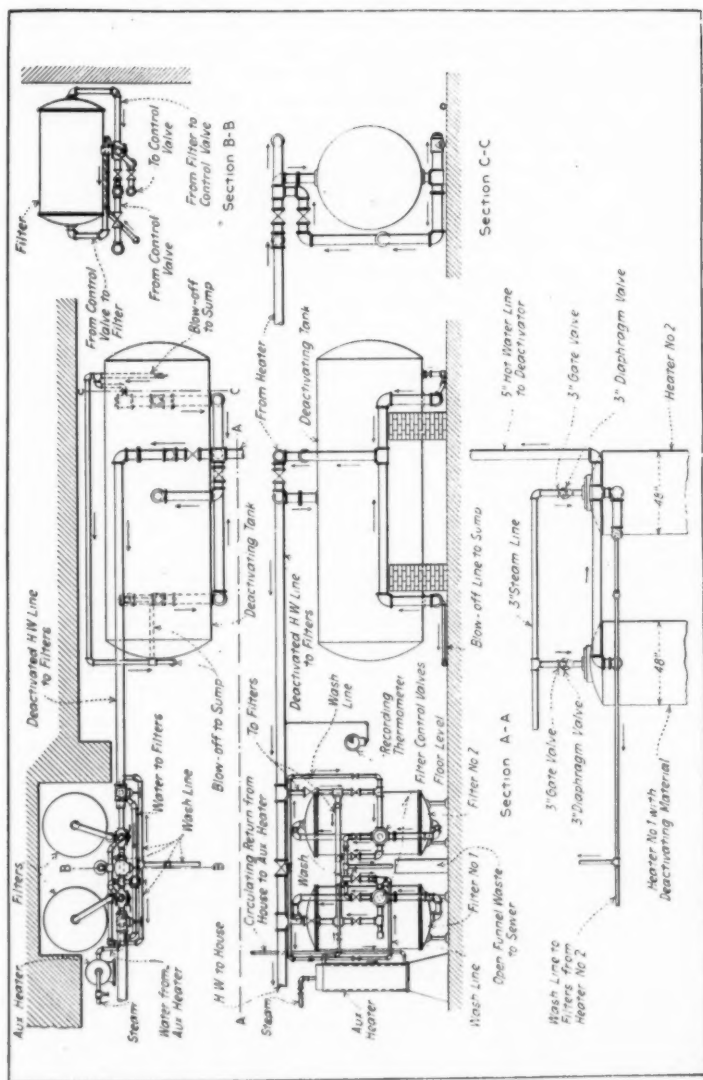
ARRANGEMENT OF PIPING AND FILTERS IN DEACTIVATING PLANT OF 12-STORY APARTMENT BUILDING.
